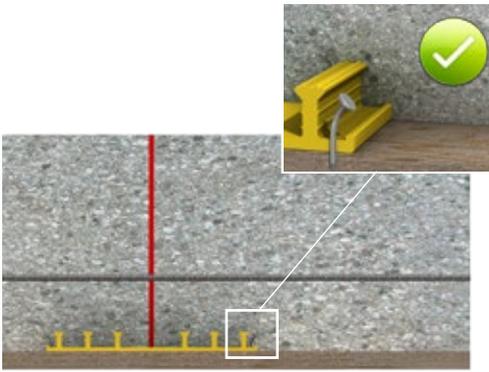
Nailing external waterbars to the wall formwork through their nail strap section
